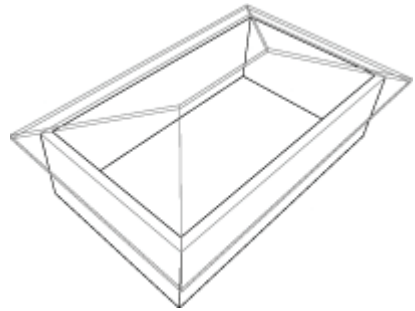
Cut 3D Object - Cut Walls to Roof Line - VI
